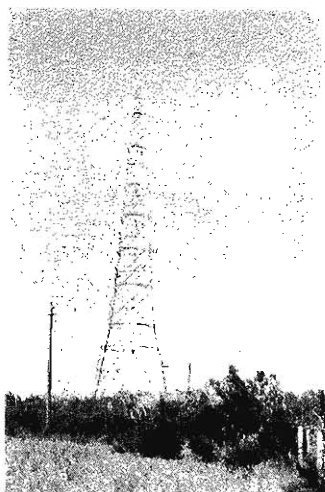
Damage to a steel truss antenna : separation of paint by wind.
